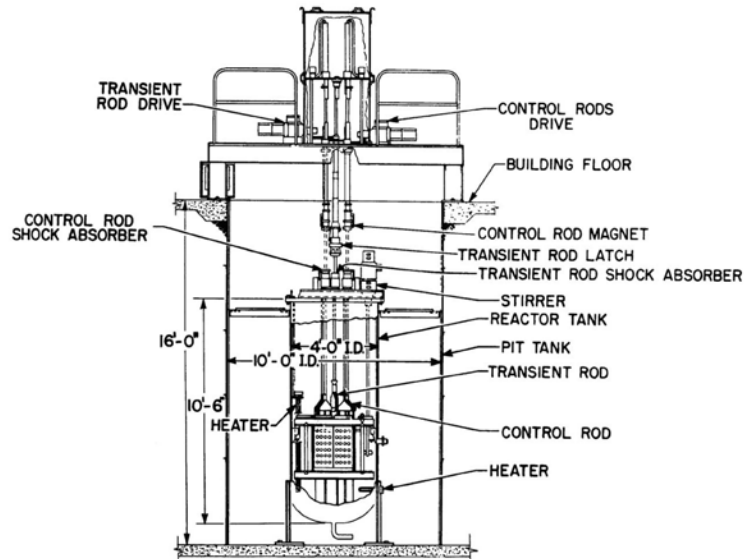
Spert I Facility Elevation Cutaway Showing A-Core Structure (Ref. A-3)
